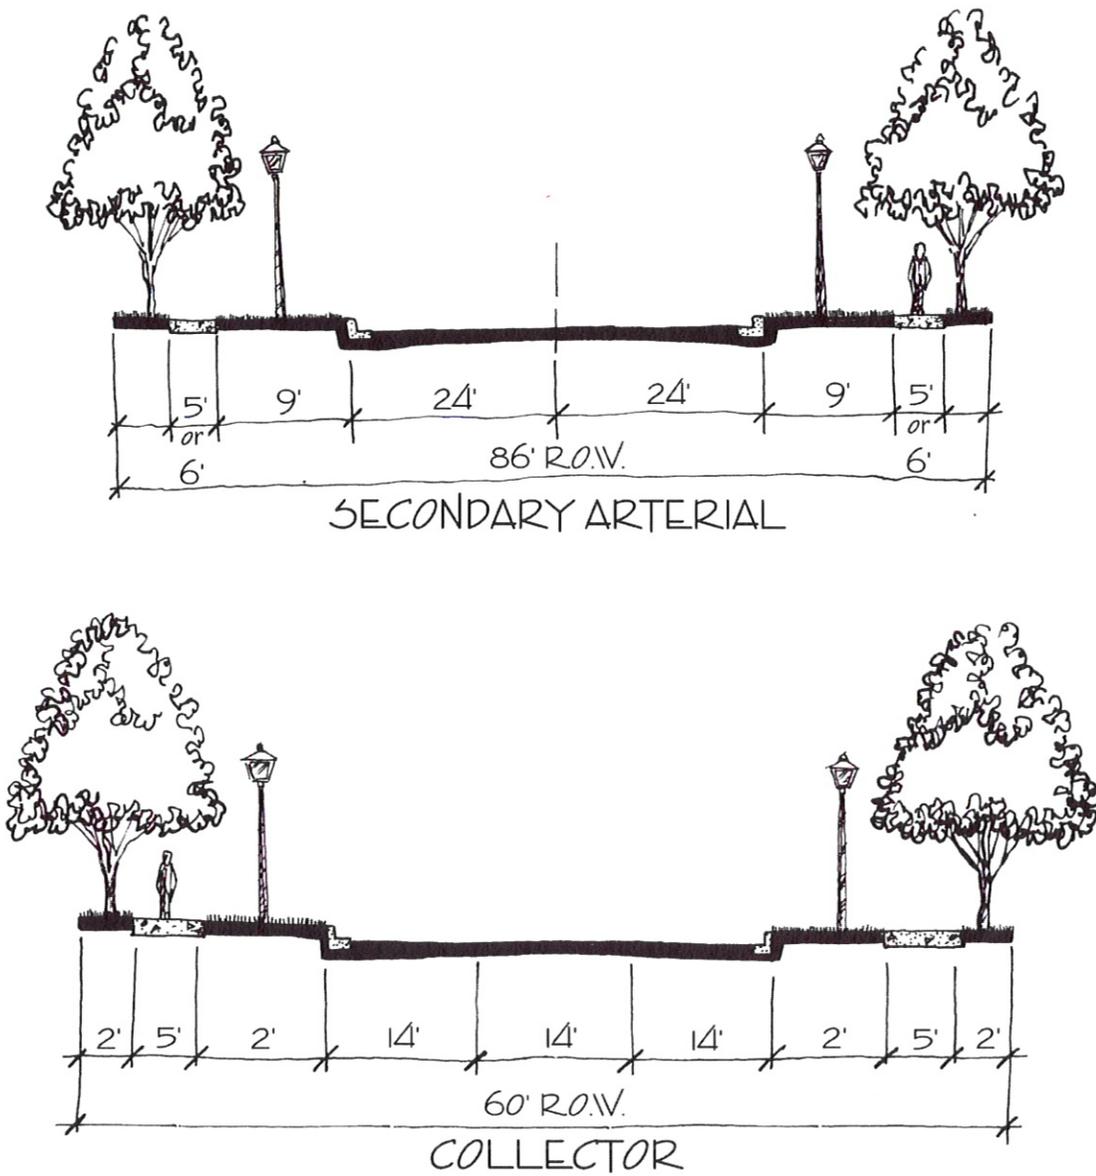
Sample cross sections including 5' sidewalks (not to scale)
